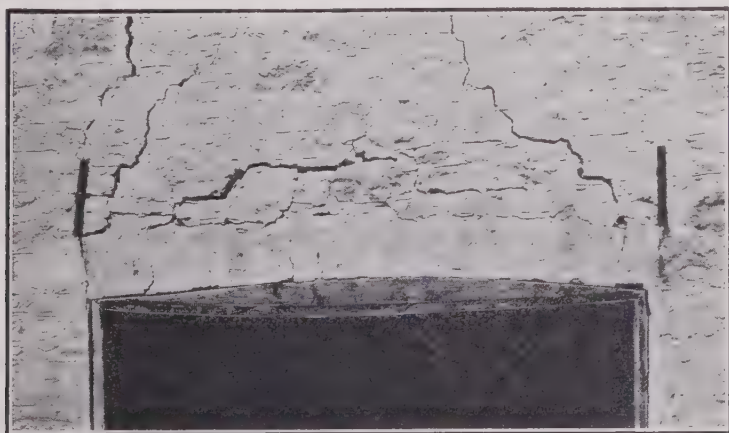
CRACKS IN STONE WALL DUE TO FAILURE OF SUPPORT.
